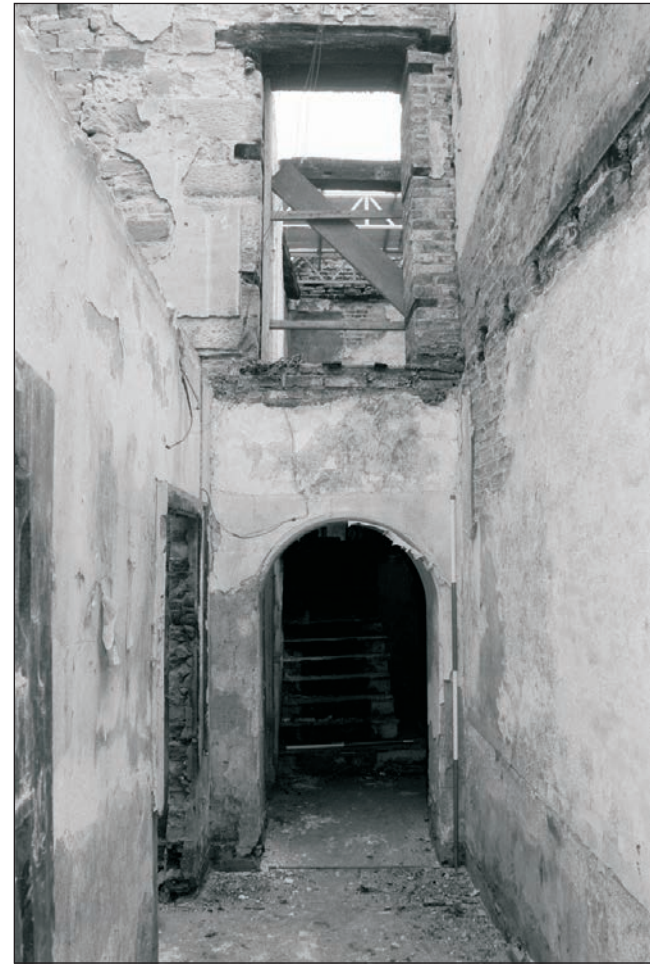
General view of hallway G2, Building 4 (Film 29.35)
